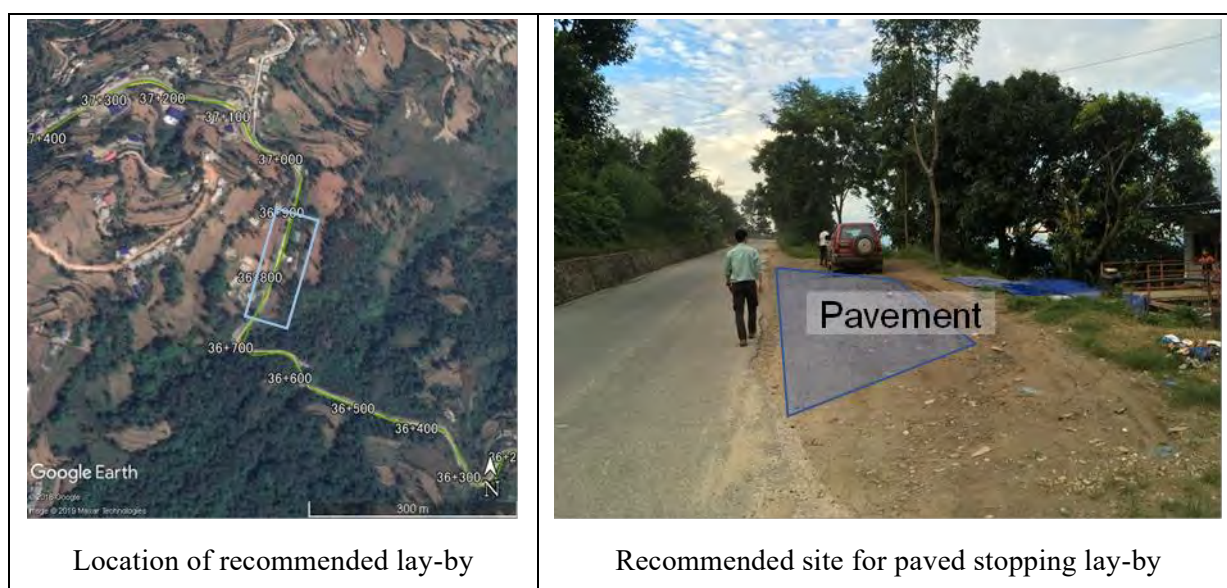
Example of Recommended Site for Paved Stopping Lay-By
